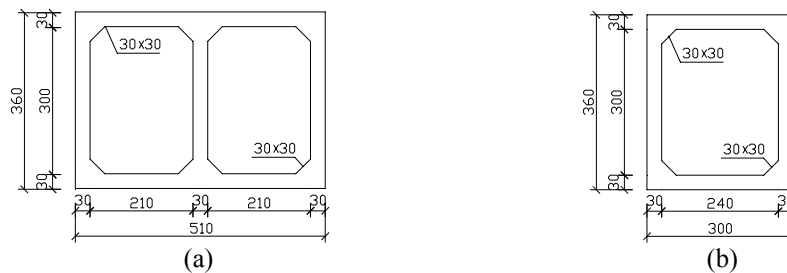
The tied beam cross section (unit: cm): (a) Center tied beam, (b) Side tied beam.
